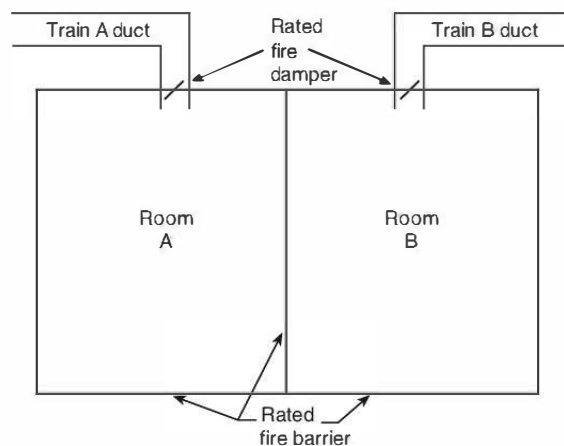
Typical Air Duct Fire Damper Configuration.
